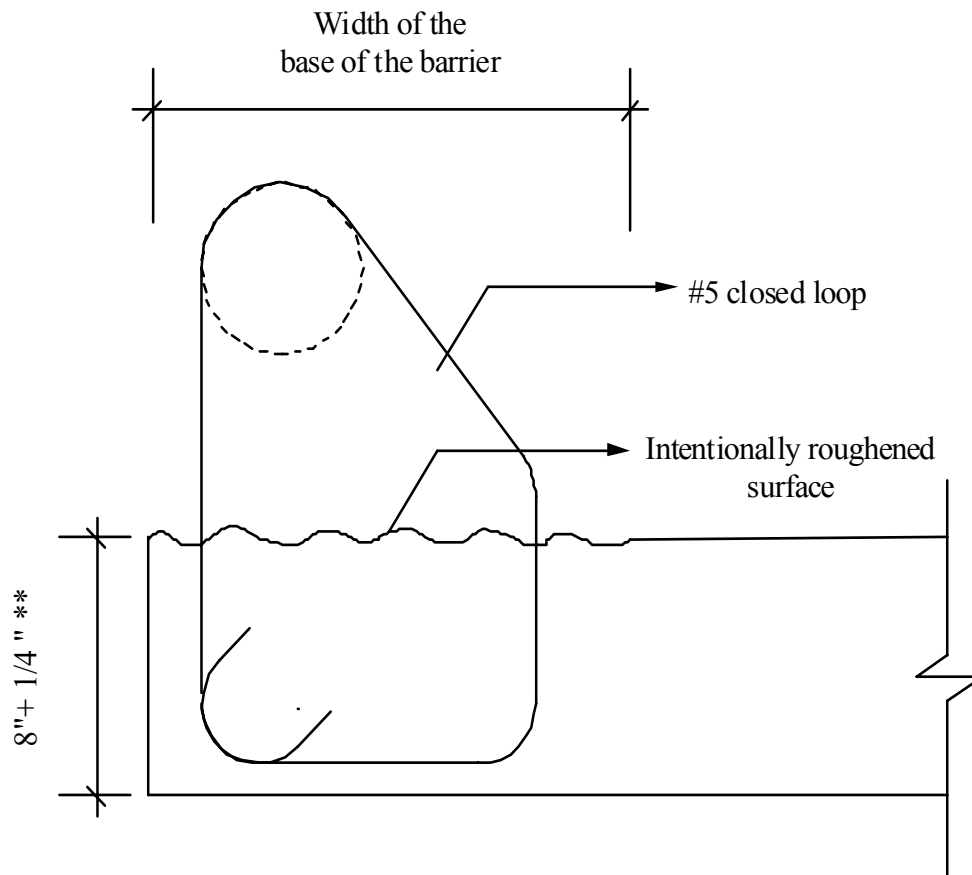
CD-1, Detail H for the Panel-to-Barrier Connection
